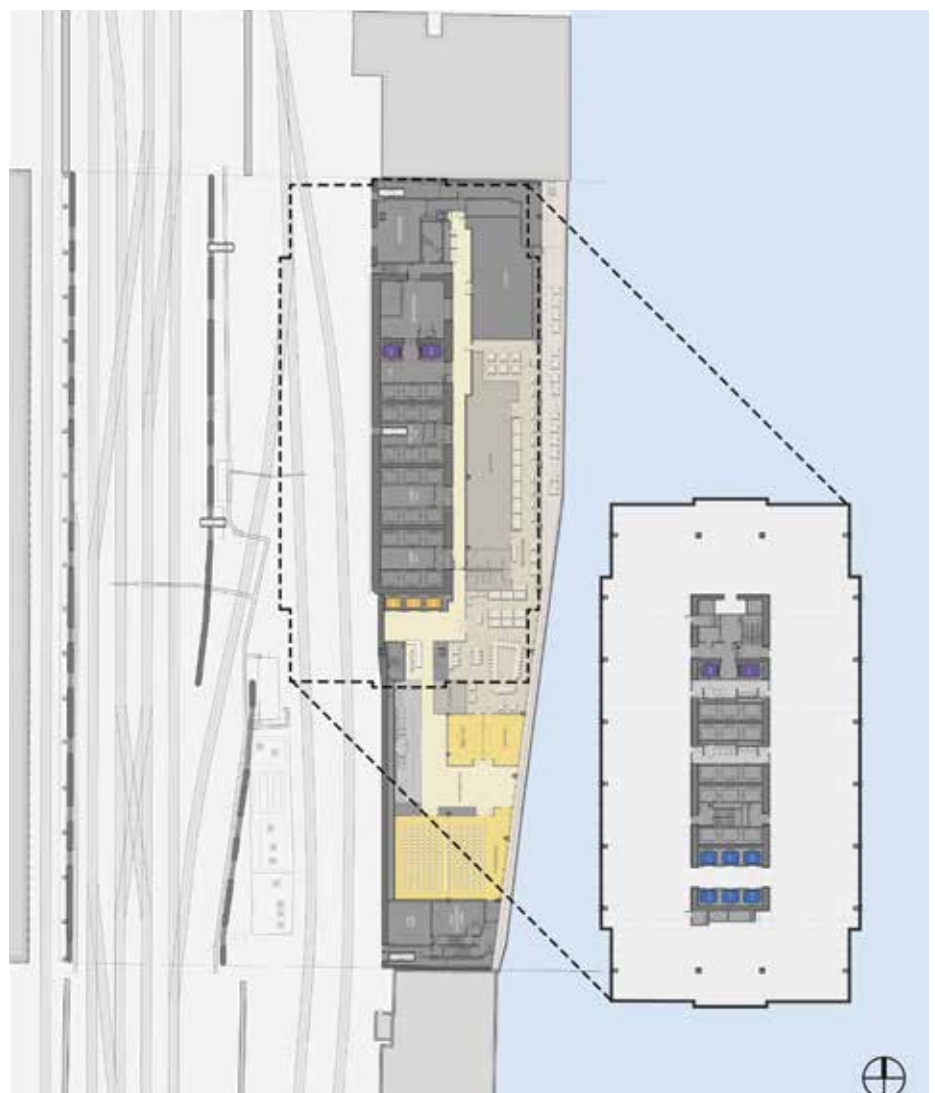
Podium floor plan with tracks as well as typical office floor plan (Source: Goettsch Partners)
